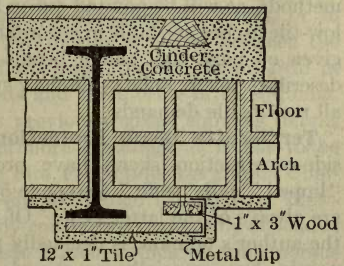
Girder Protection, Union Trust Co.'s Bldg., Baltimore Fire.
